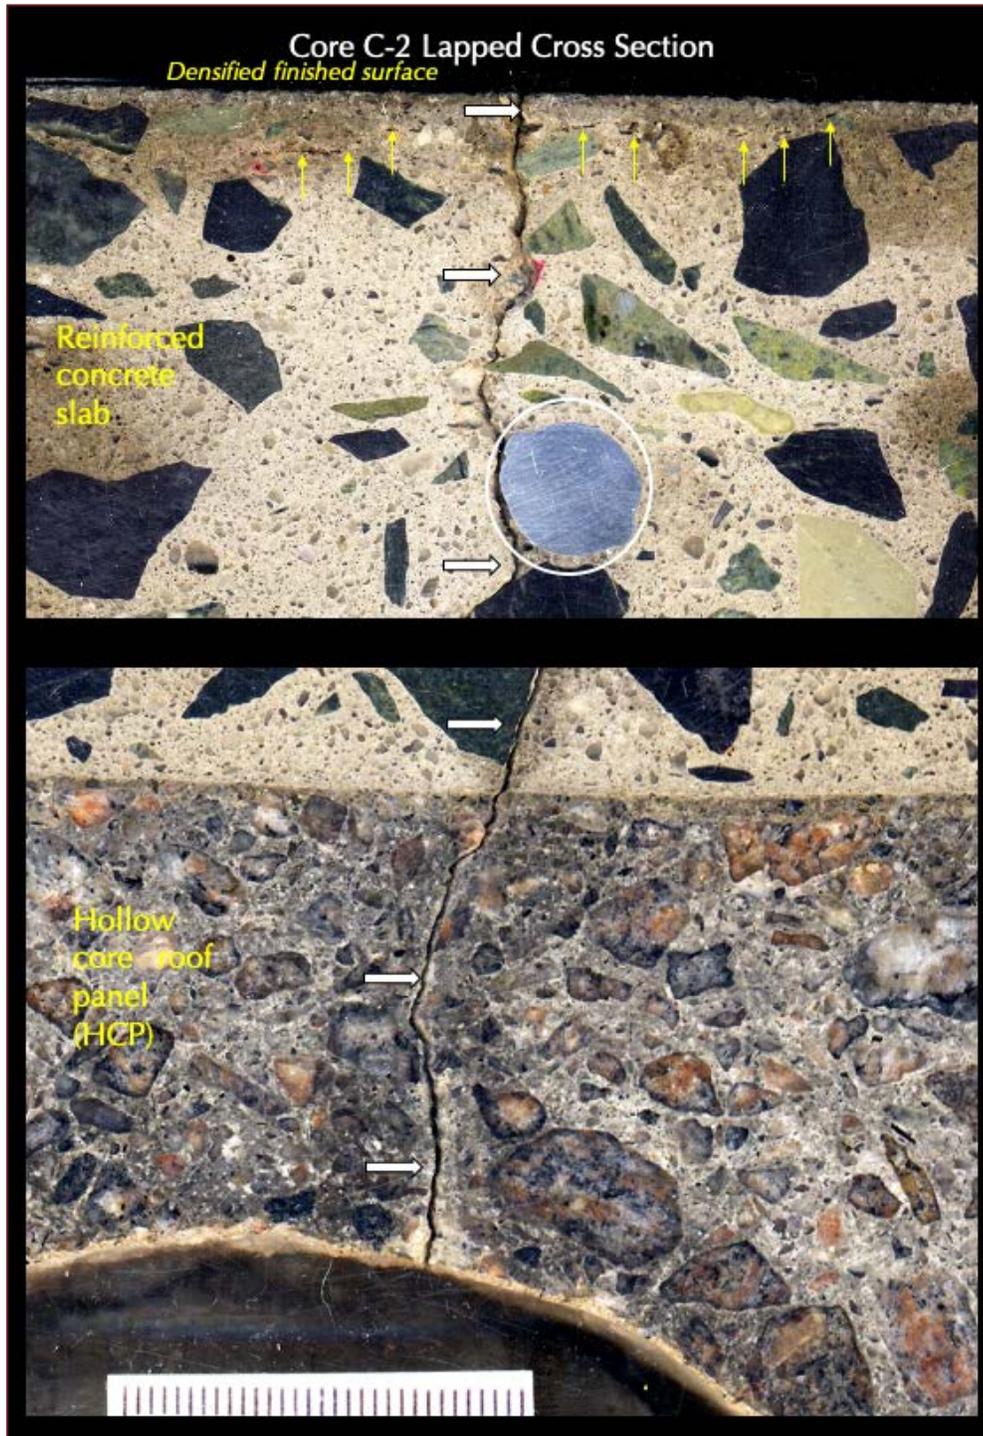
Lapped cross section of Core C-2 showing: (a) the reinforced concrete slab (RCS) at the top, well-bonded to the hollow core roof panel (HCP) at the bottom; (b) crushed volcanic stone coarse aggregate of 1 in. (25 mm) nominal size in RCS, as opposed to crushed granite coarse aggregate of $\frac{1}{2}$ in. (12.5 mm) nominal size in HCP; (c) medium beige color tone of paste in RCS as opposed to darker gray paste in HCP; (d) densified finished surface of RCS at the top $\frac{1}{8}$ in., which has developed short, elongated gaps or separations as incipient delaminations (marked with fine vertical arrows) from the main body; (e) relatively better grading of crushed granite coarse aggregate in HCP as opposed to crushed volcanic rock coarse aggregate in RCS; (f) overall dense and well-consolidated natures of RCS and HCP concretes; and (g) a long continuous vertical crack transected through both RCS and HCP components and circumscribed the reinforcing steel at the mid-depth location of RCS.
